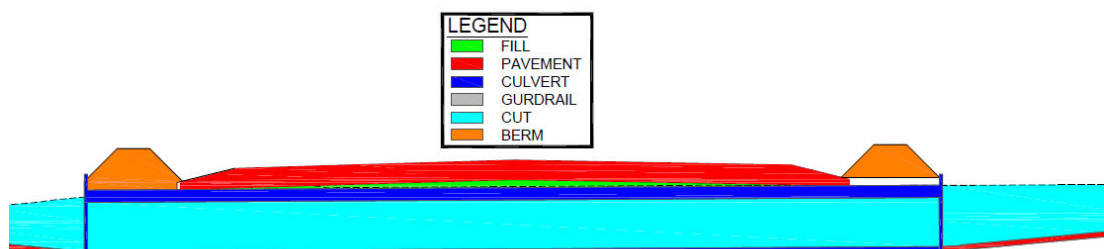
Additional works - Haul vehicle / light vehicle intersection
